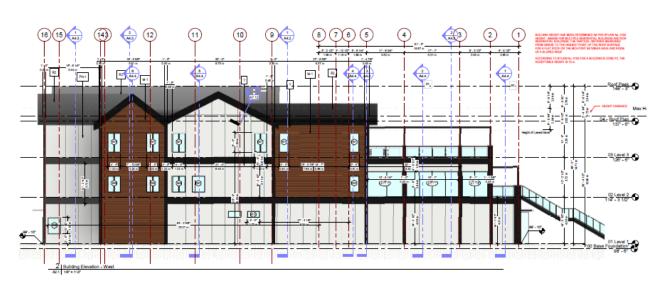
West Elevation (facing adjacent development, "The Waterfront")
